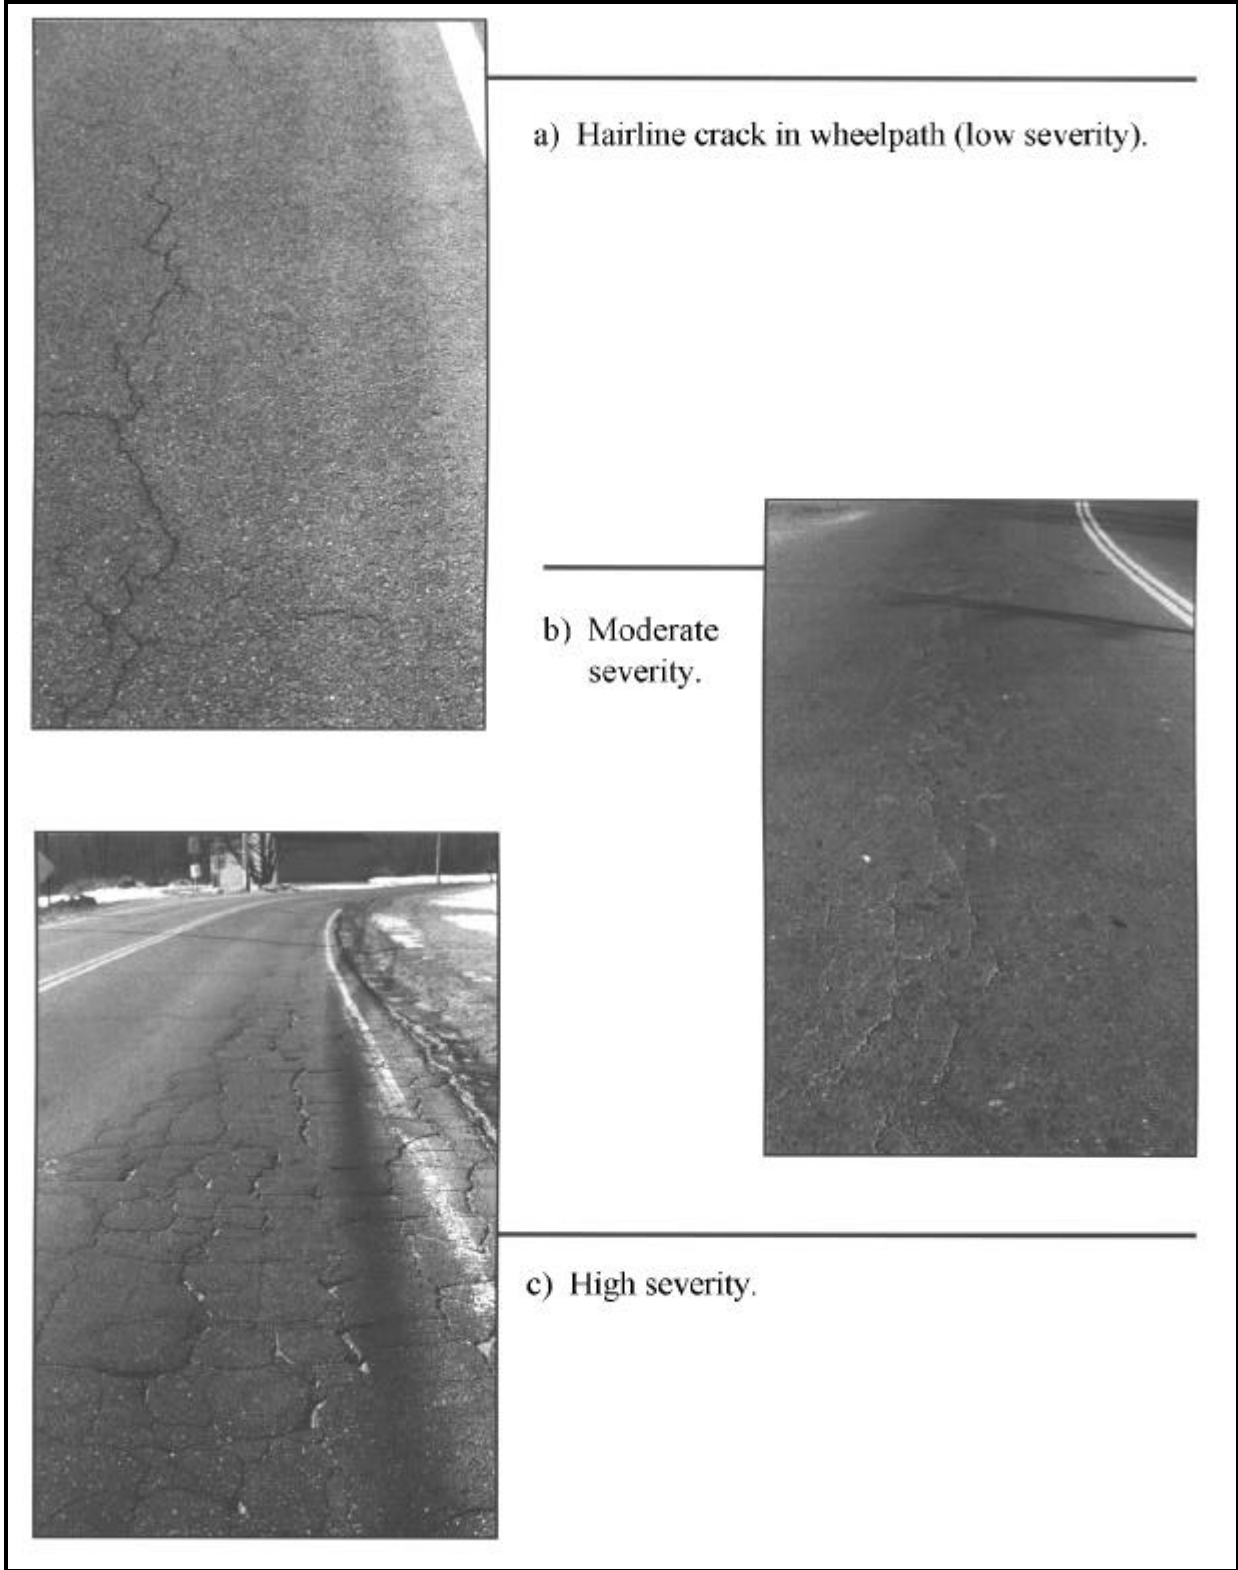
Typical progression of fatigue (alligator) cracking in HMA surface.⁽²⁶⁾
